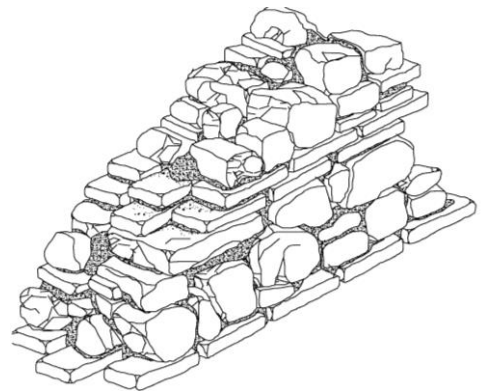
Regular mixed wall (Naima Mahindad, 2016)
